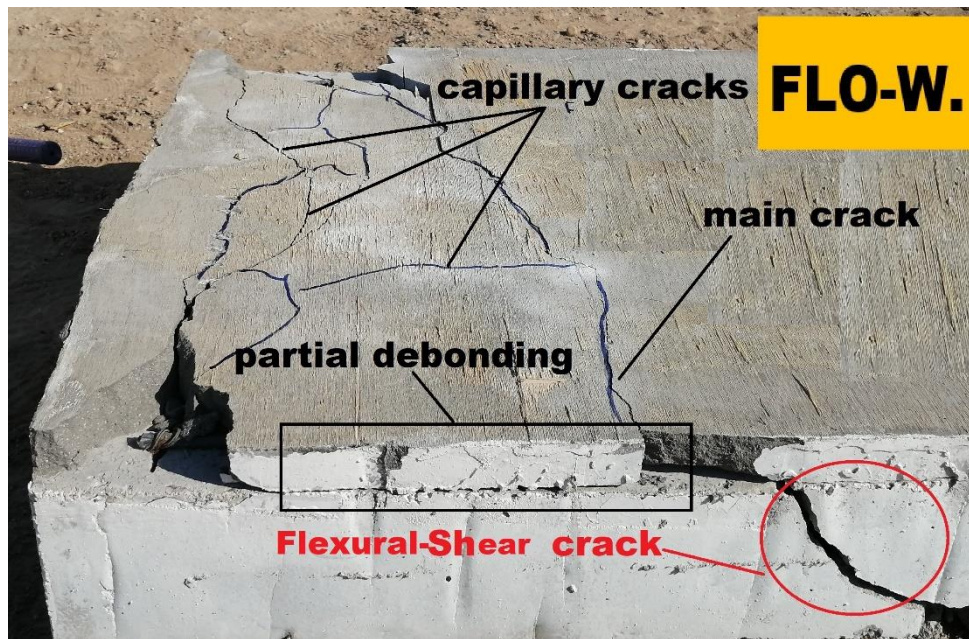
Mode of failure and crack patterns for specimen FLO-W.
